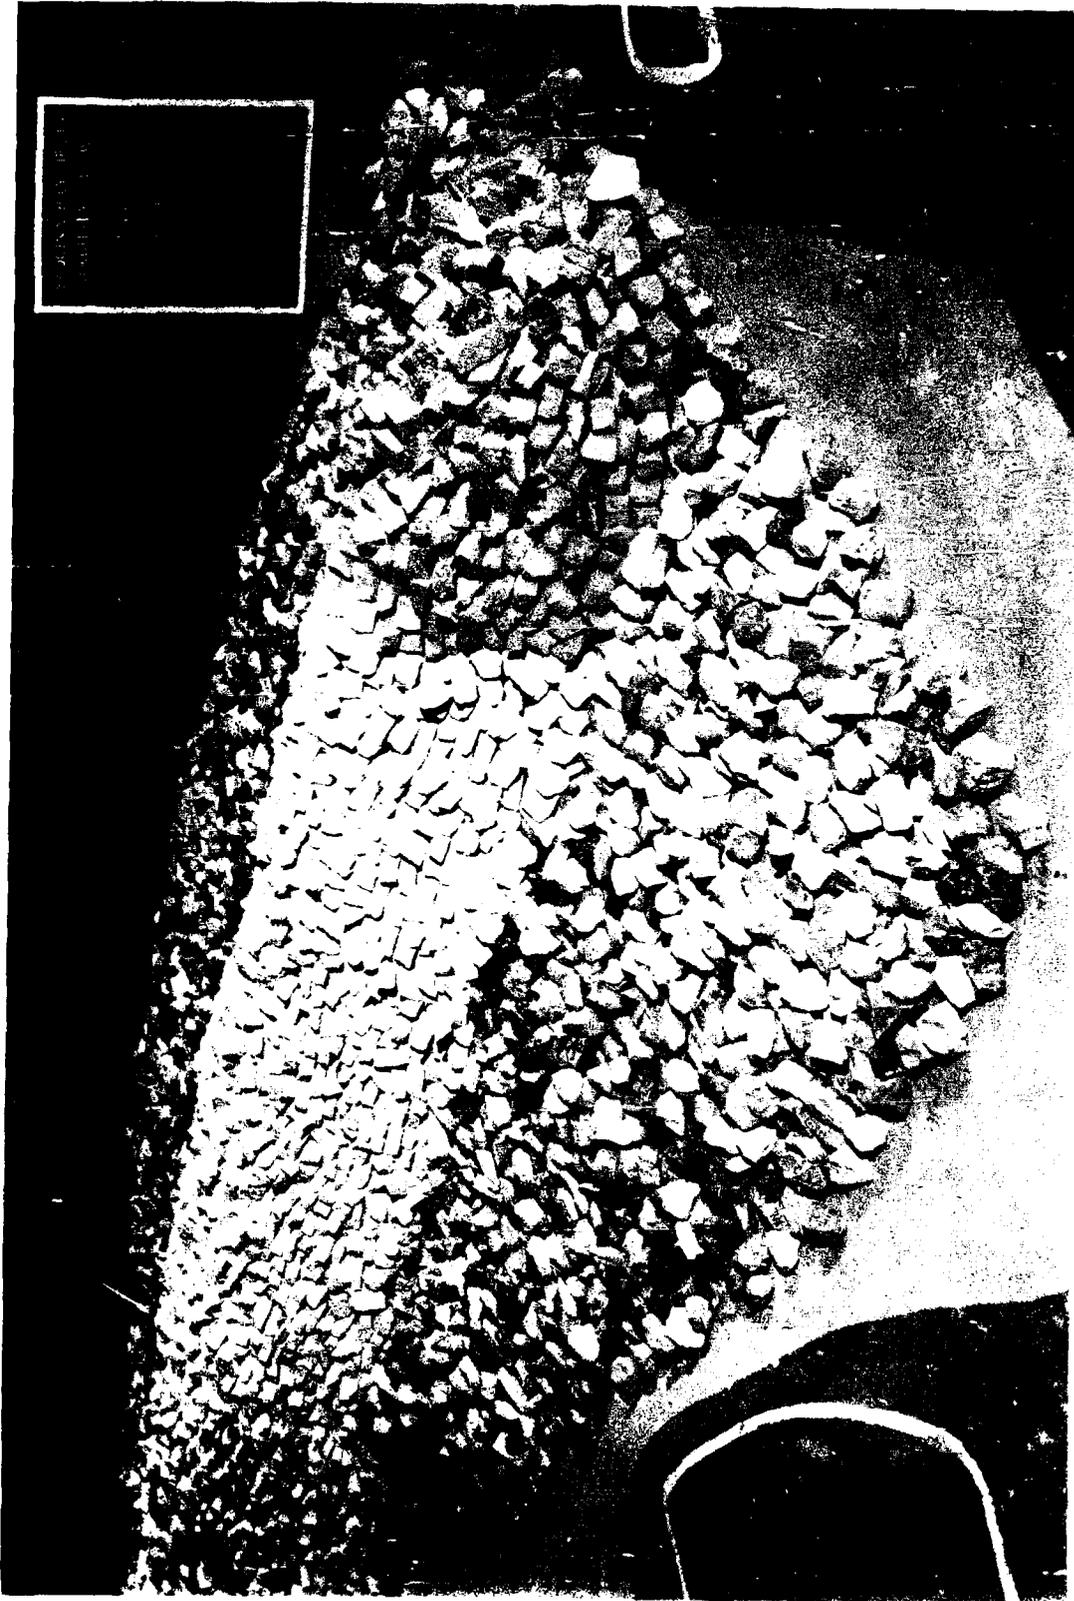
Sea-side view of structure after all testing at 0.0-ft swl
